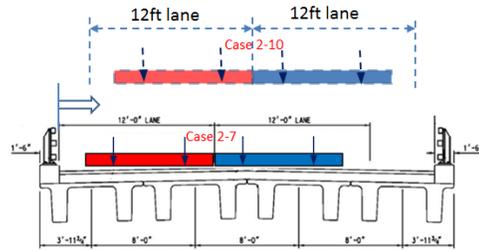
Loading profile for Case 2-7 (note: bridge section adapted from [2])
